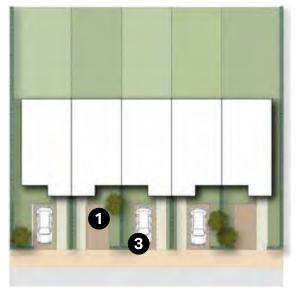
An illustrative diagram showing an indicative layout of on-plot front parking.
